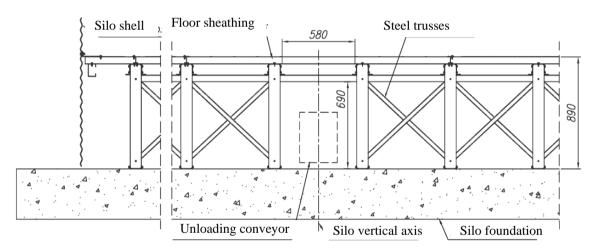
A steel floor on steel trusses - conditions for installation of an underfloor unloading conveyor.
